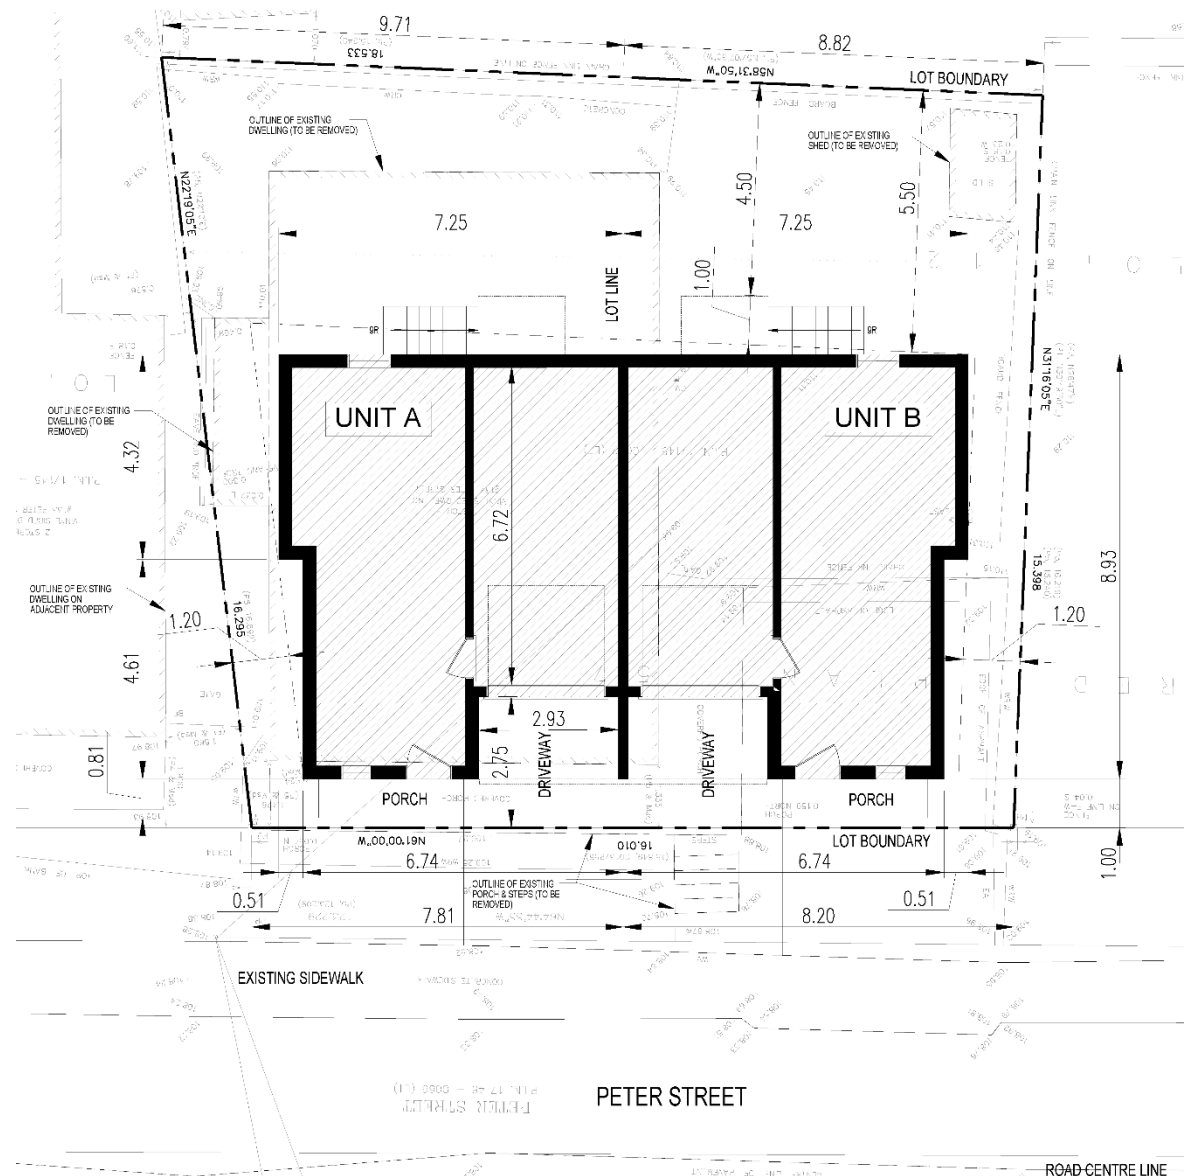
Proposed Site Plan (Source: John G. Williams Limited Architect, January 29, 2021)
